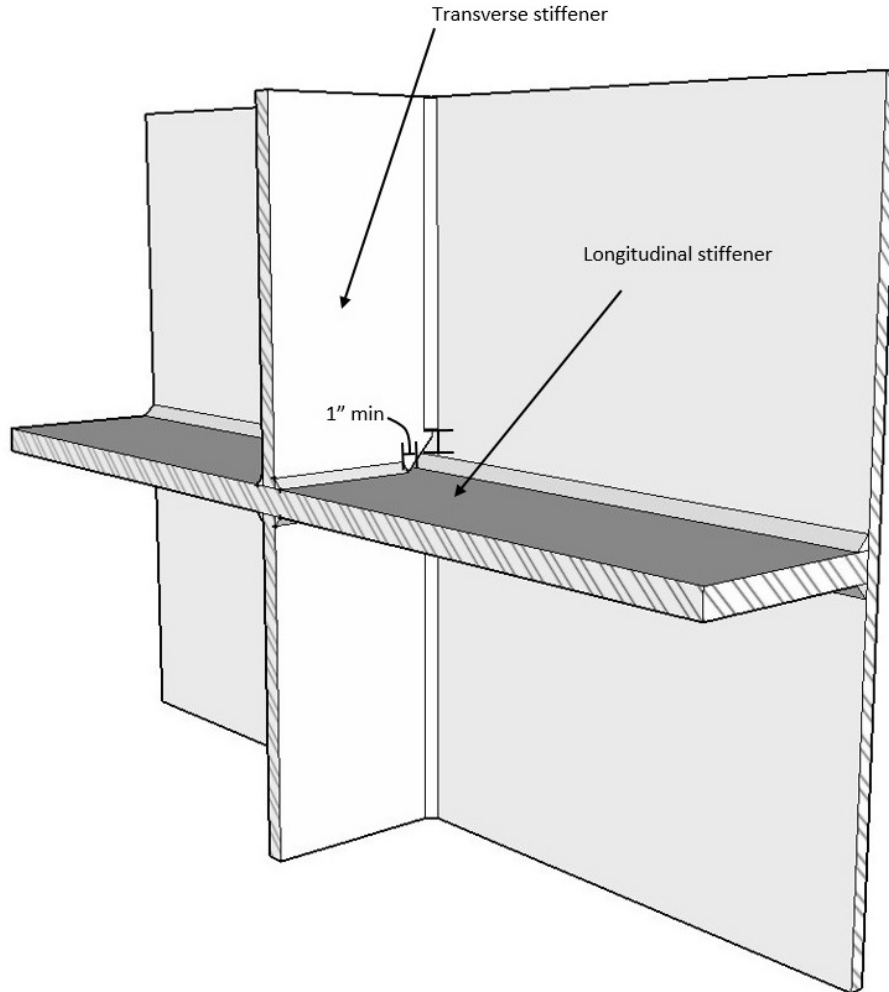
Weld detail where the longitudinal stiffener is continuous.
